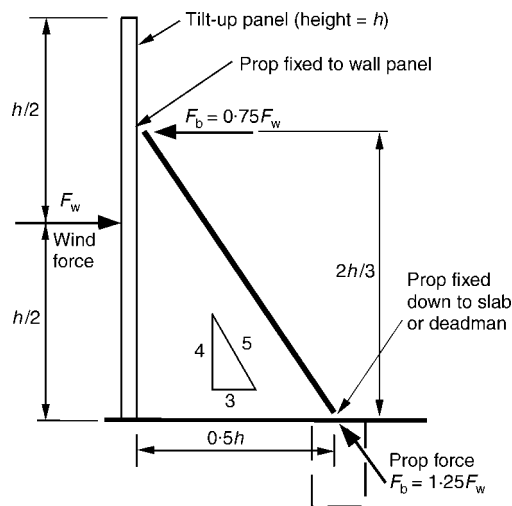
Typical bracing set-up (courtesy Reinforced Concrete Council)
